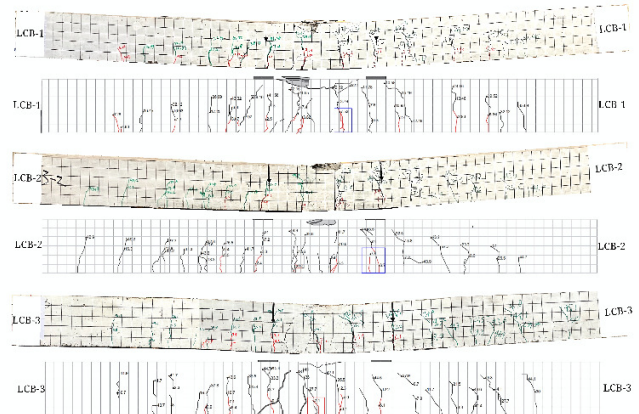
Flexural crack pattern at ultimate load for reinforced concrete beams with MCS reinforcement.
